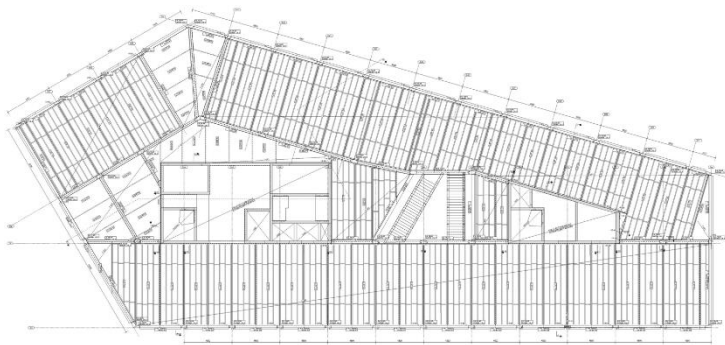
Typical structural floorplan, showing the main load-bearing components.
